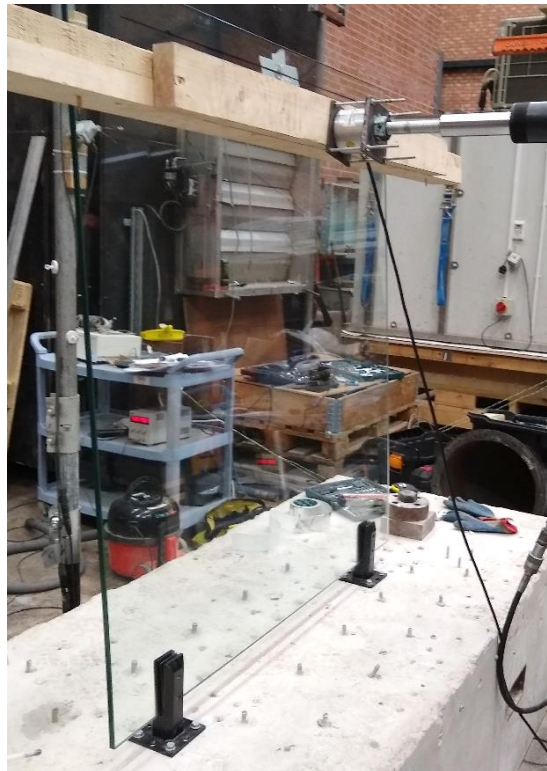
Test 3a – 12 mm Toughened Glass – UNI 10806 Test – Load Application Side
